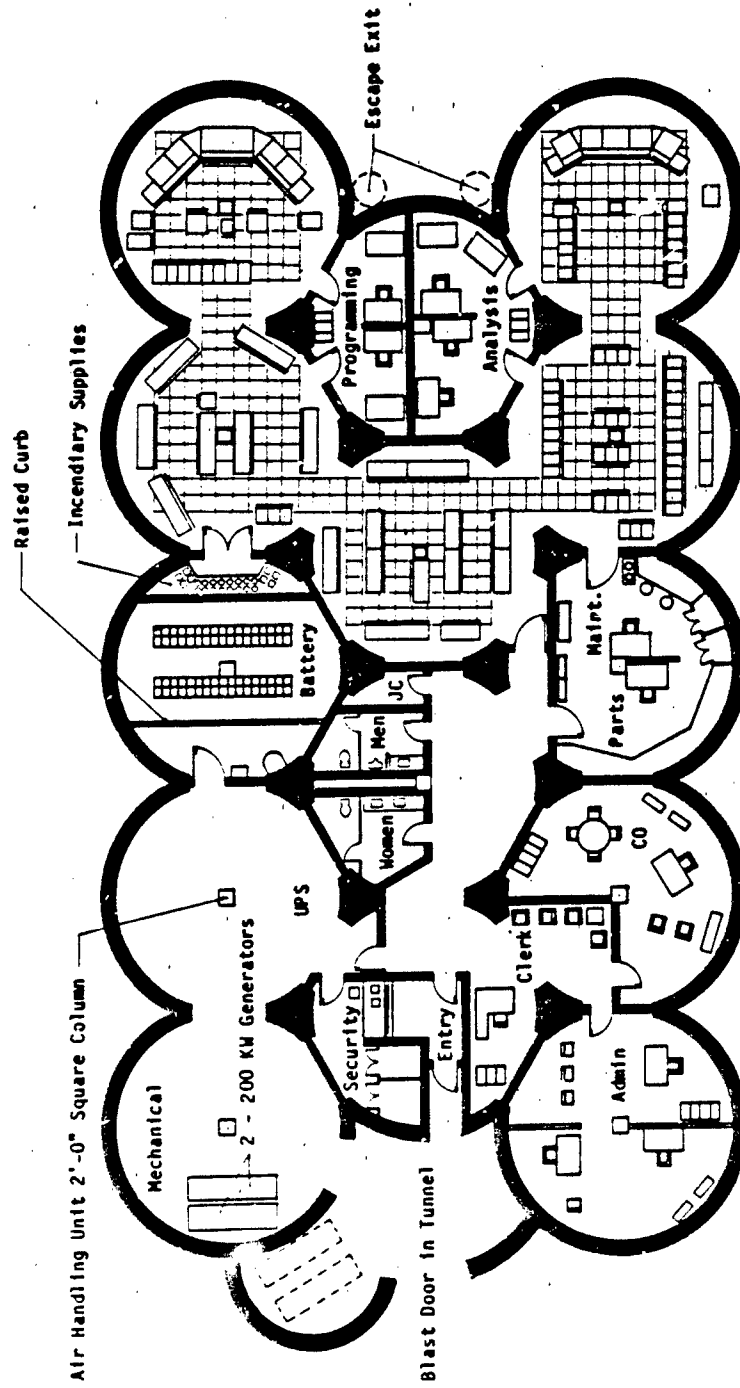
AUTODIN SWITCH FACILITY PLAN--DOME CONFIGURATION.
